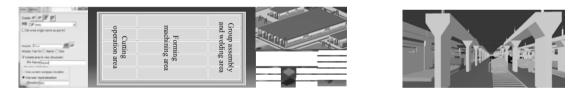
(a) Production area plan and building ,and equipment;(b)Parametric model of steel machining workshop
